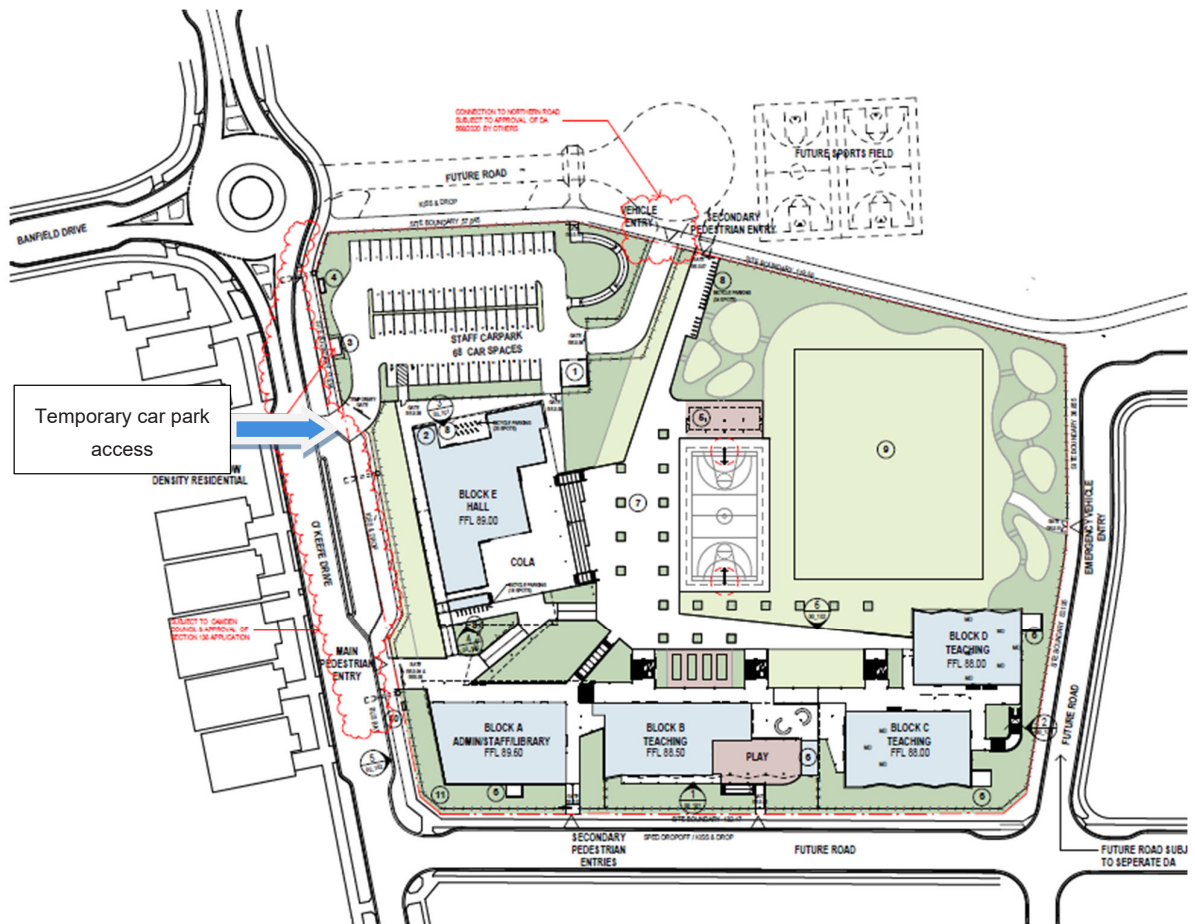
Site Plan – Temporary Car Park Access (Source: Perumal Pedavoli, September 2020)
